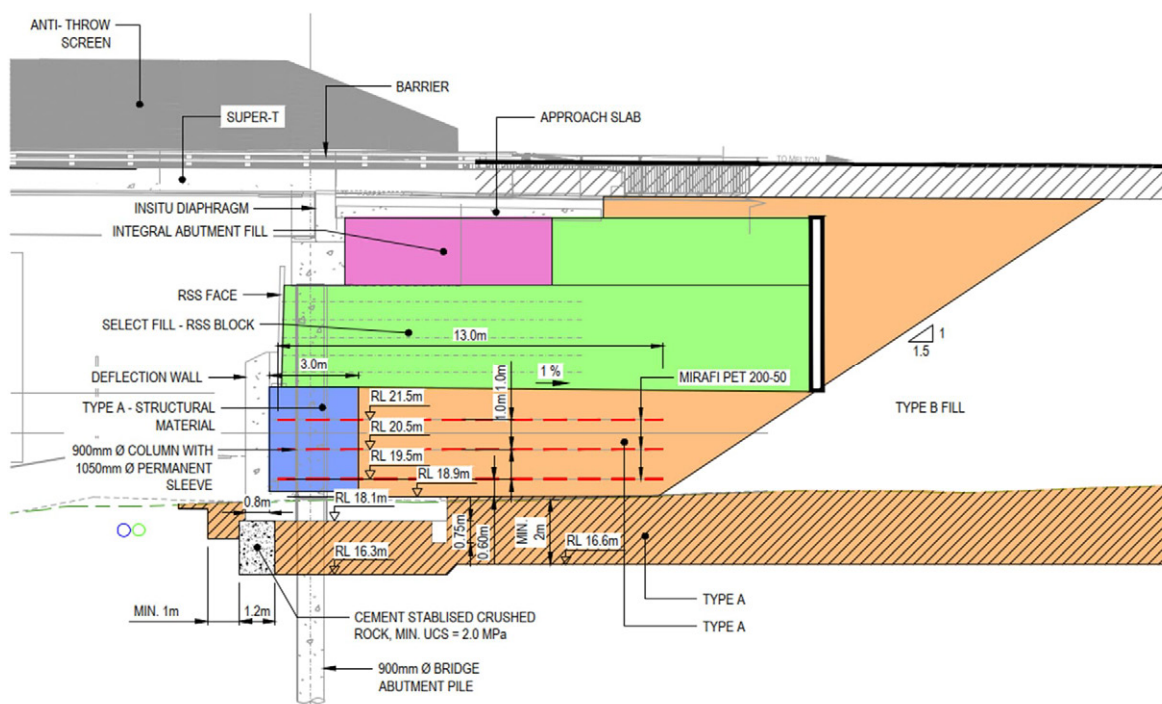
Hybrid retaining wall (L-shape wall + RSS wall) with ground improvement at north abutment
